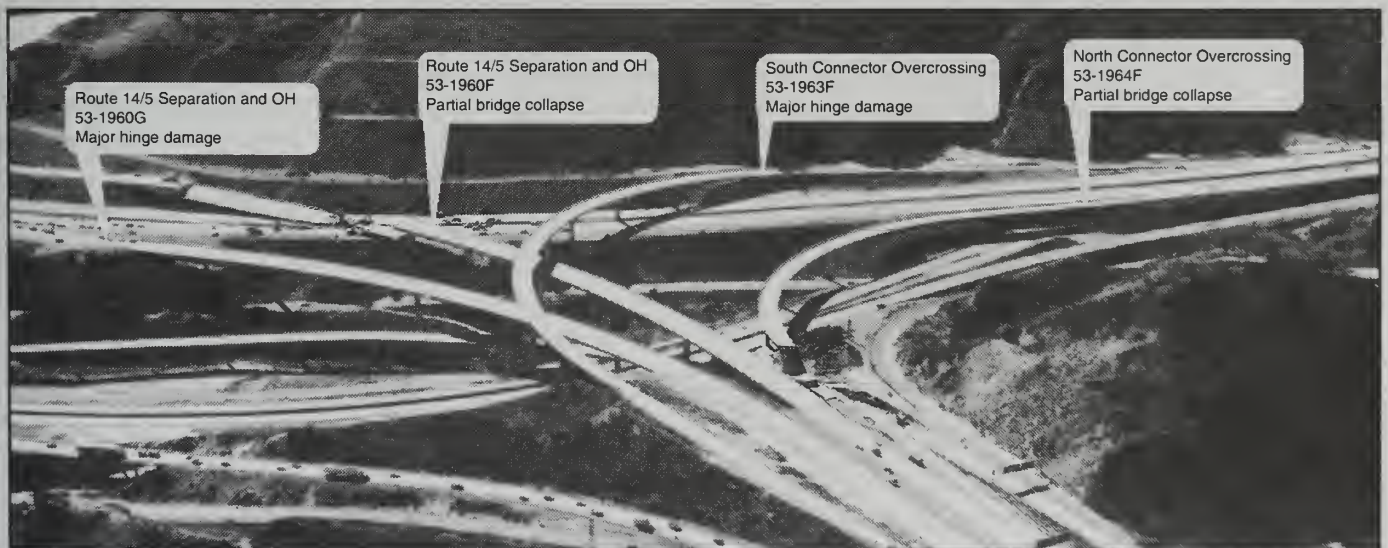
Bridge damage at Location 2 - Route 14/5 Interchange Overhead (53-1960F).
